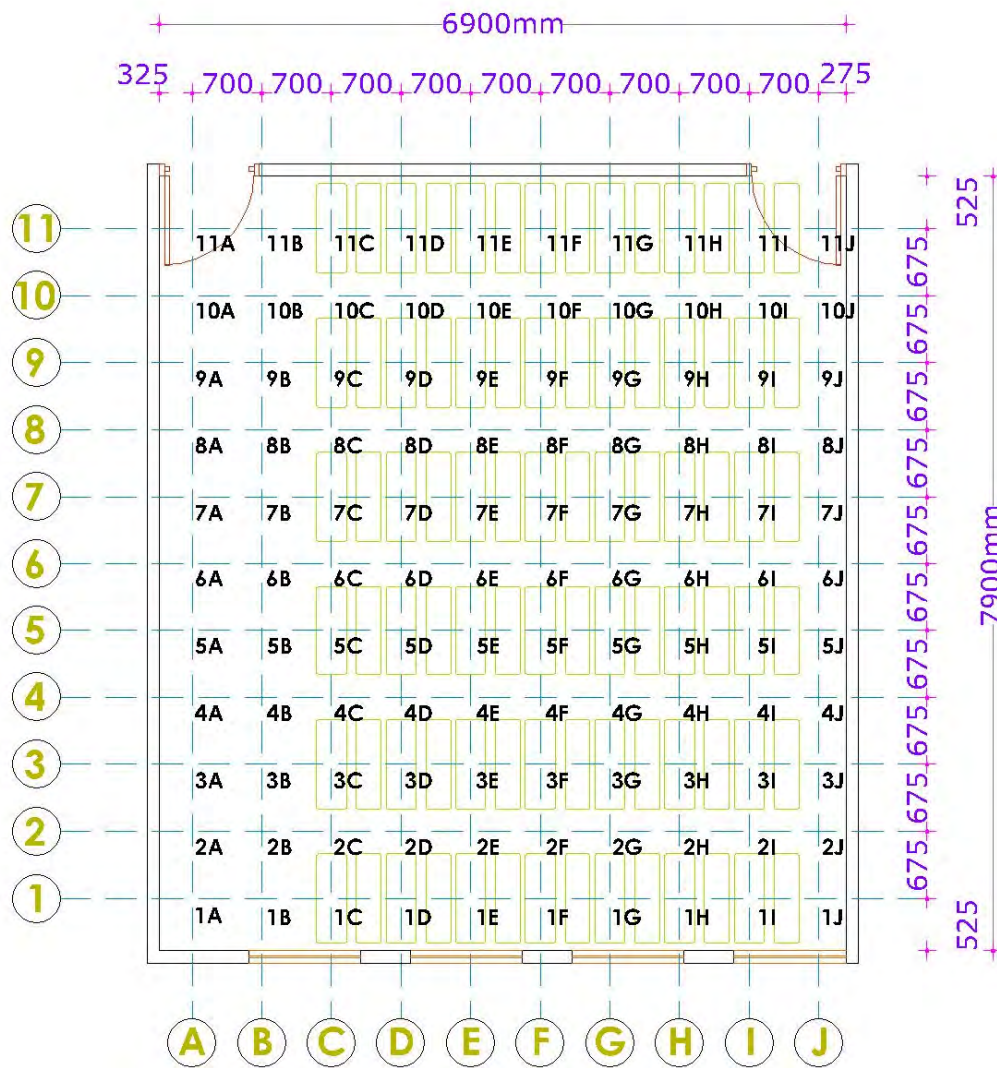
Plan of existing classroom at Govt. Laboratory School
